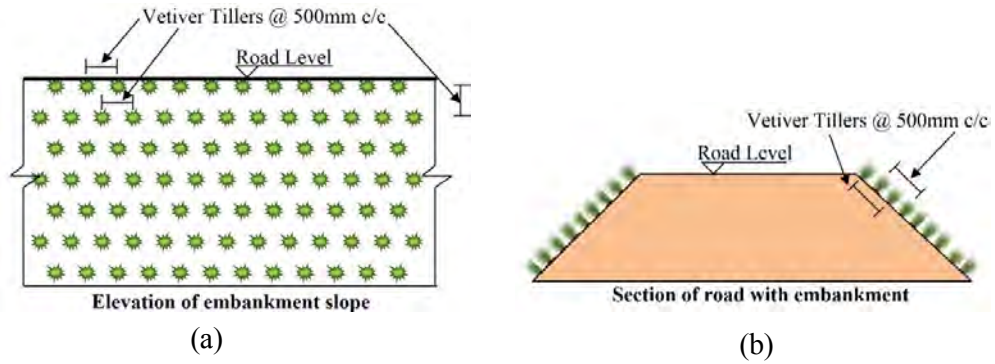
Vetiver plantation at road embankment slope: (a) elevation and (b) section
